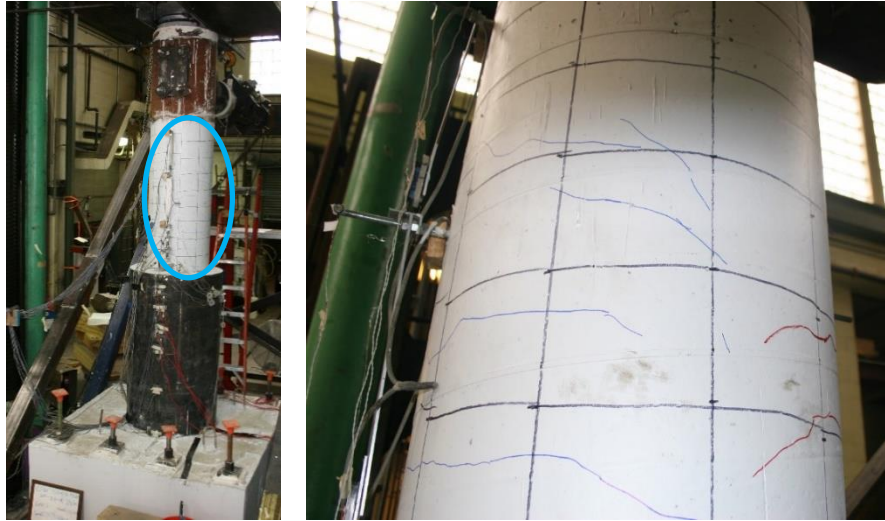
Specimen 30-21-R Horizontal Cracks at 1.1% Drift
